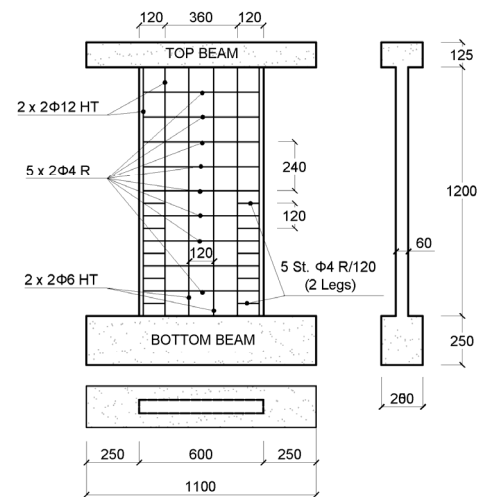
Geometry and reinforcement details of wall SW6 / Geometria e dettagli delle armature per il muro SW6.
